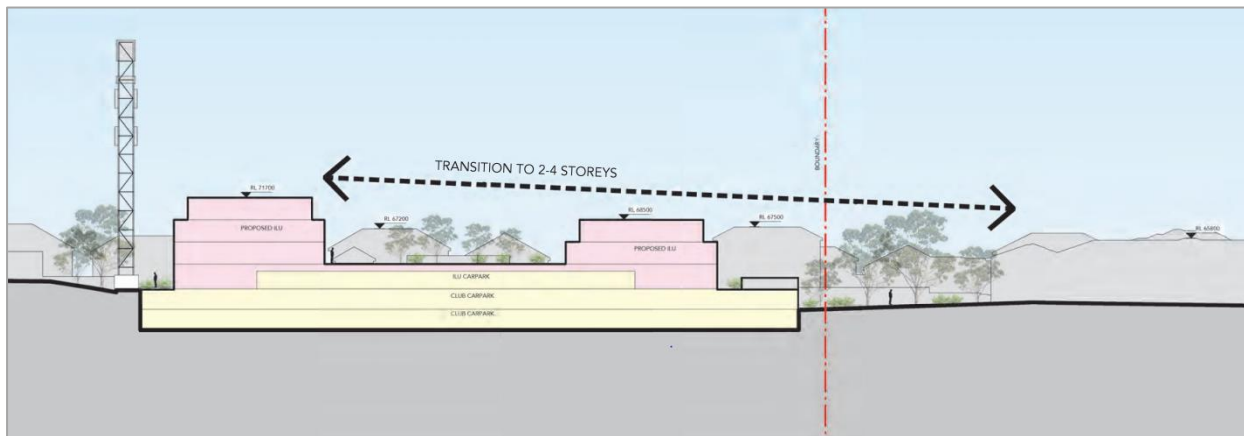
Extract of ILU Massing Section DD (Source: Team 2 Architects) (Appendix 1)
